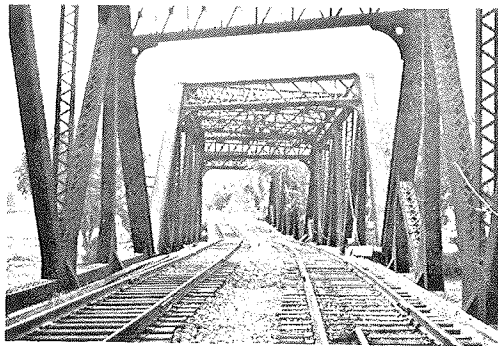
Downstream view of Lehigh Valley Railroad bridge showing pier settlement.
